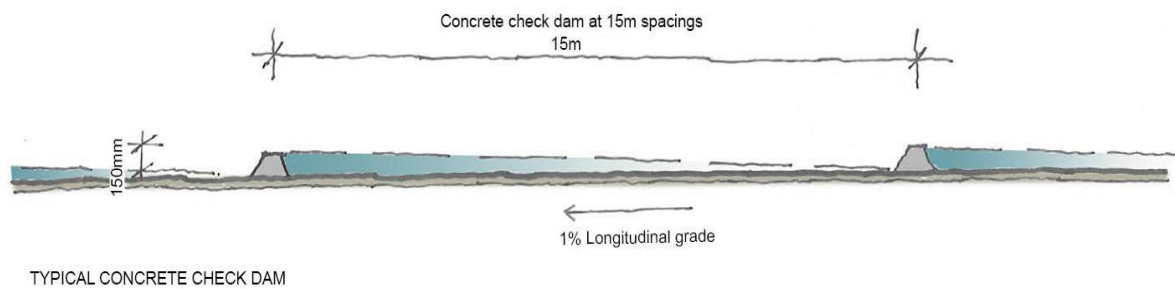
Longitudinal arrangement using concrete check dams
